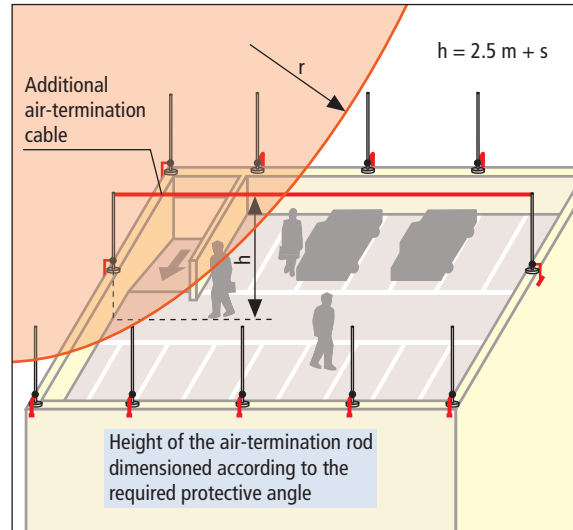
Lightning protection for car park roofs – Building and life protection IEC 62305-3 (EN 62305-3); Annex E
